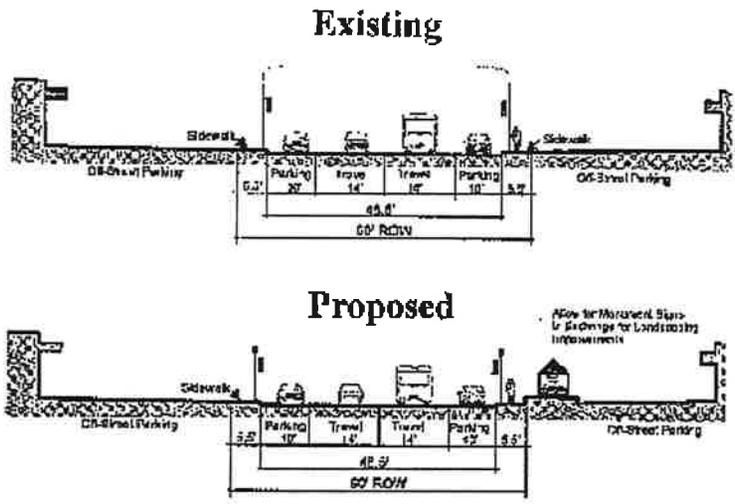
Existing and proposed street sections on Southwest 153rd Street.
